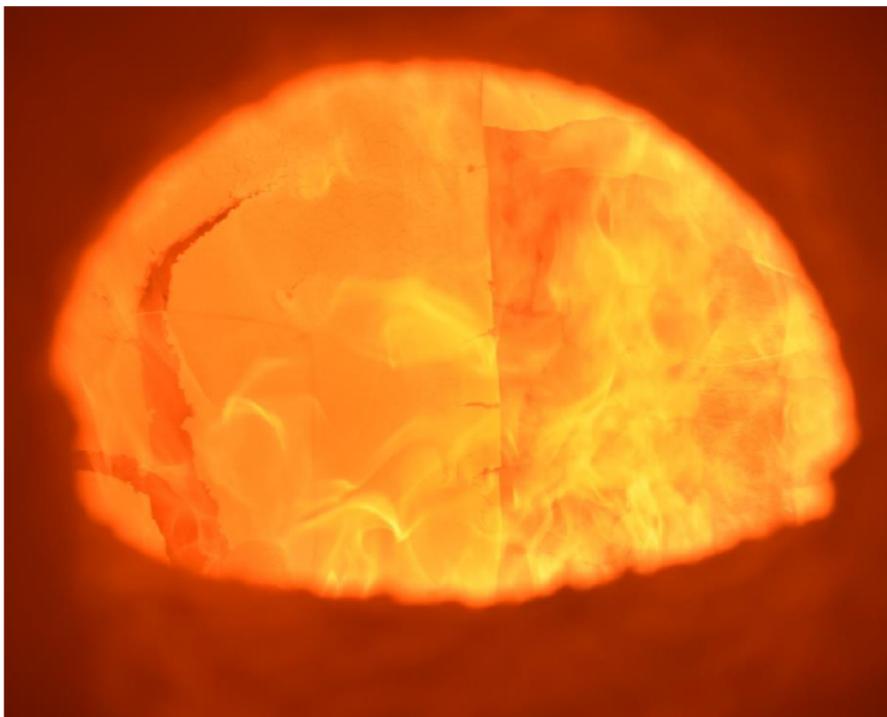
Exposed side of specimen after 90 minutes of testing.
